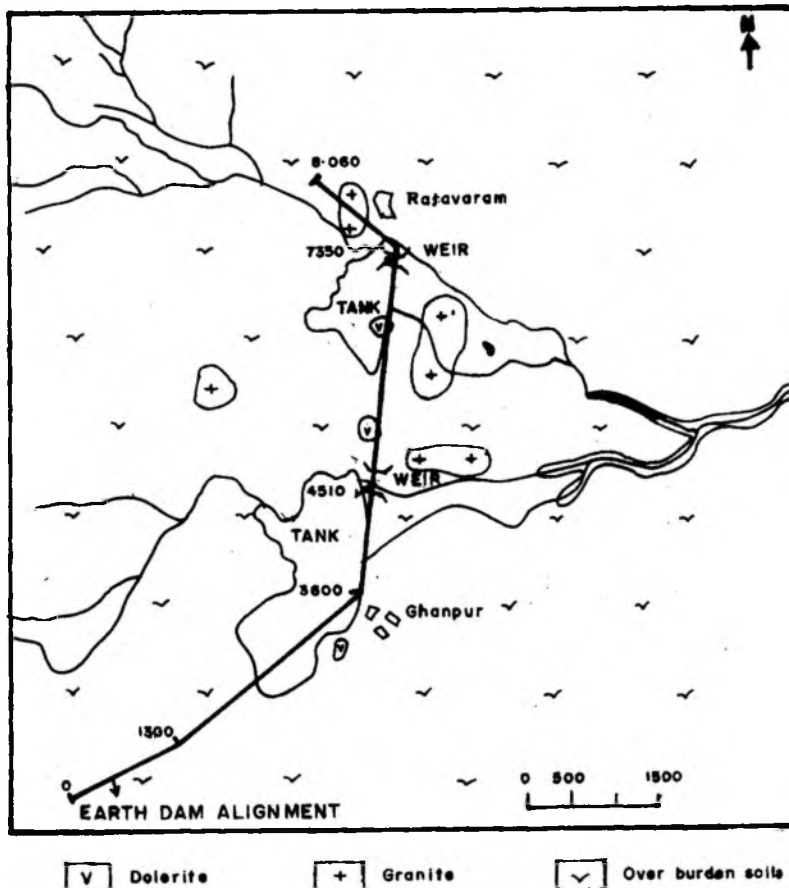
Schematic layout plan and geology of Ghanpur Tank
